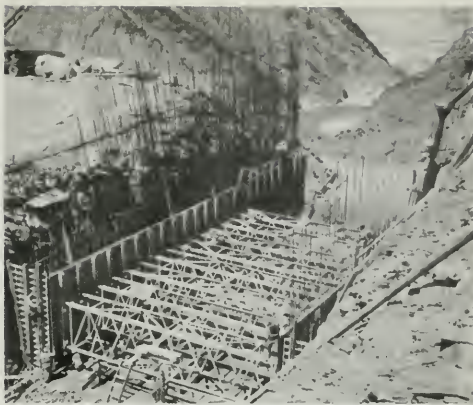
Prefabricated Steel Form Used for Spillway Walls
